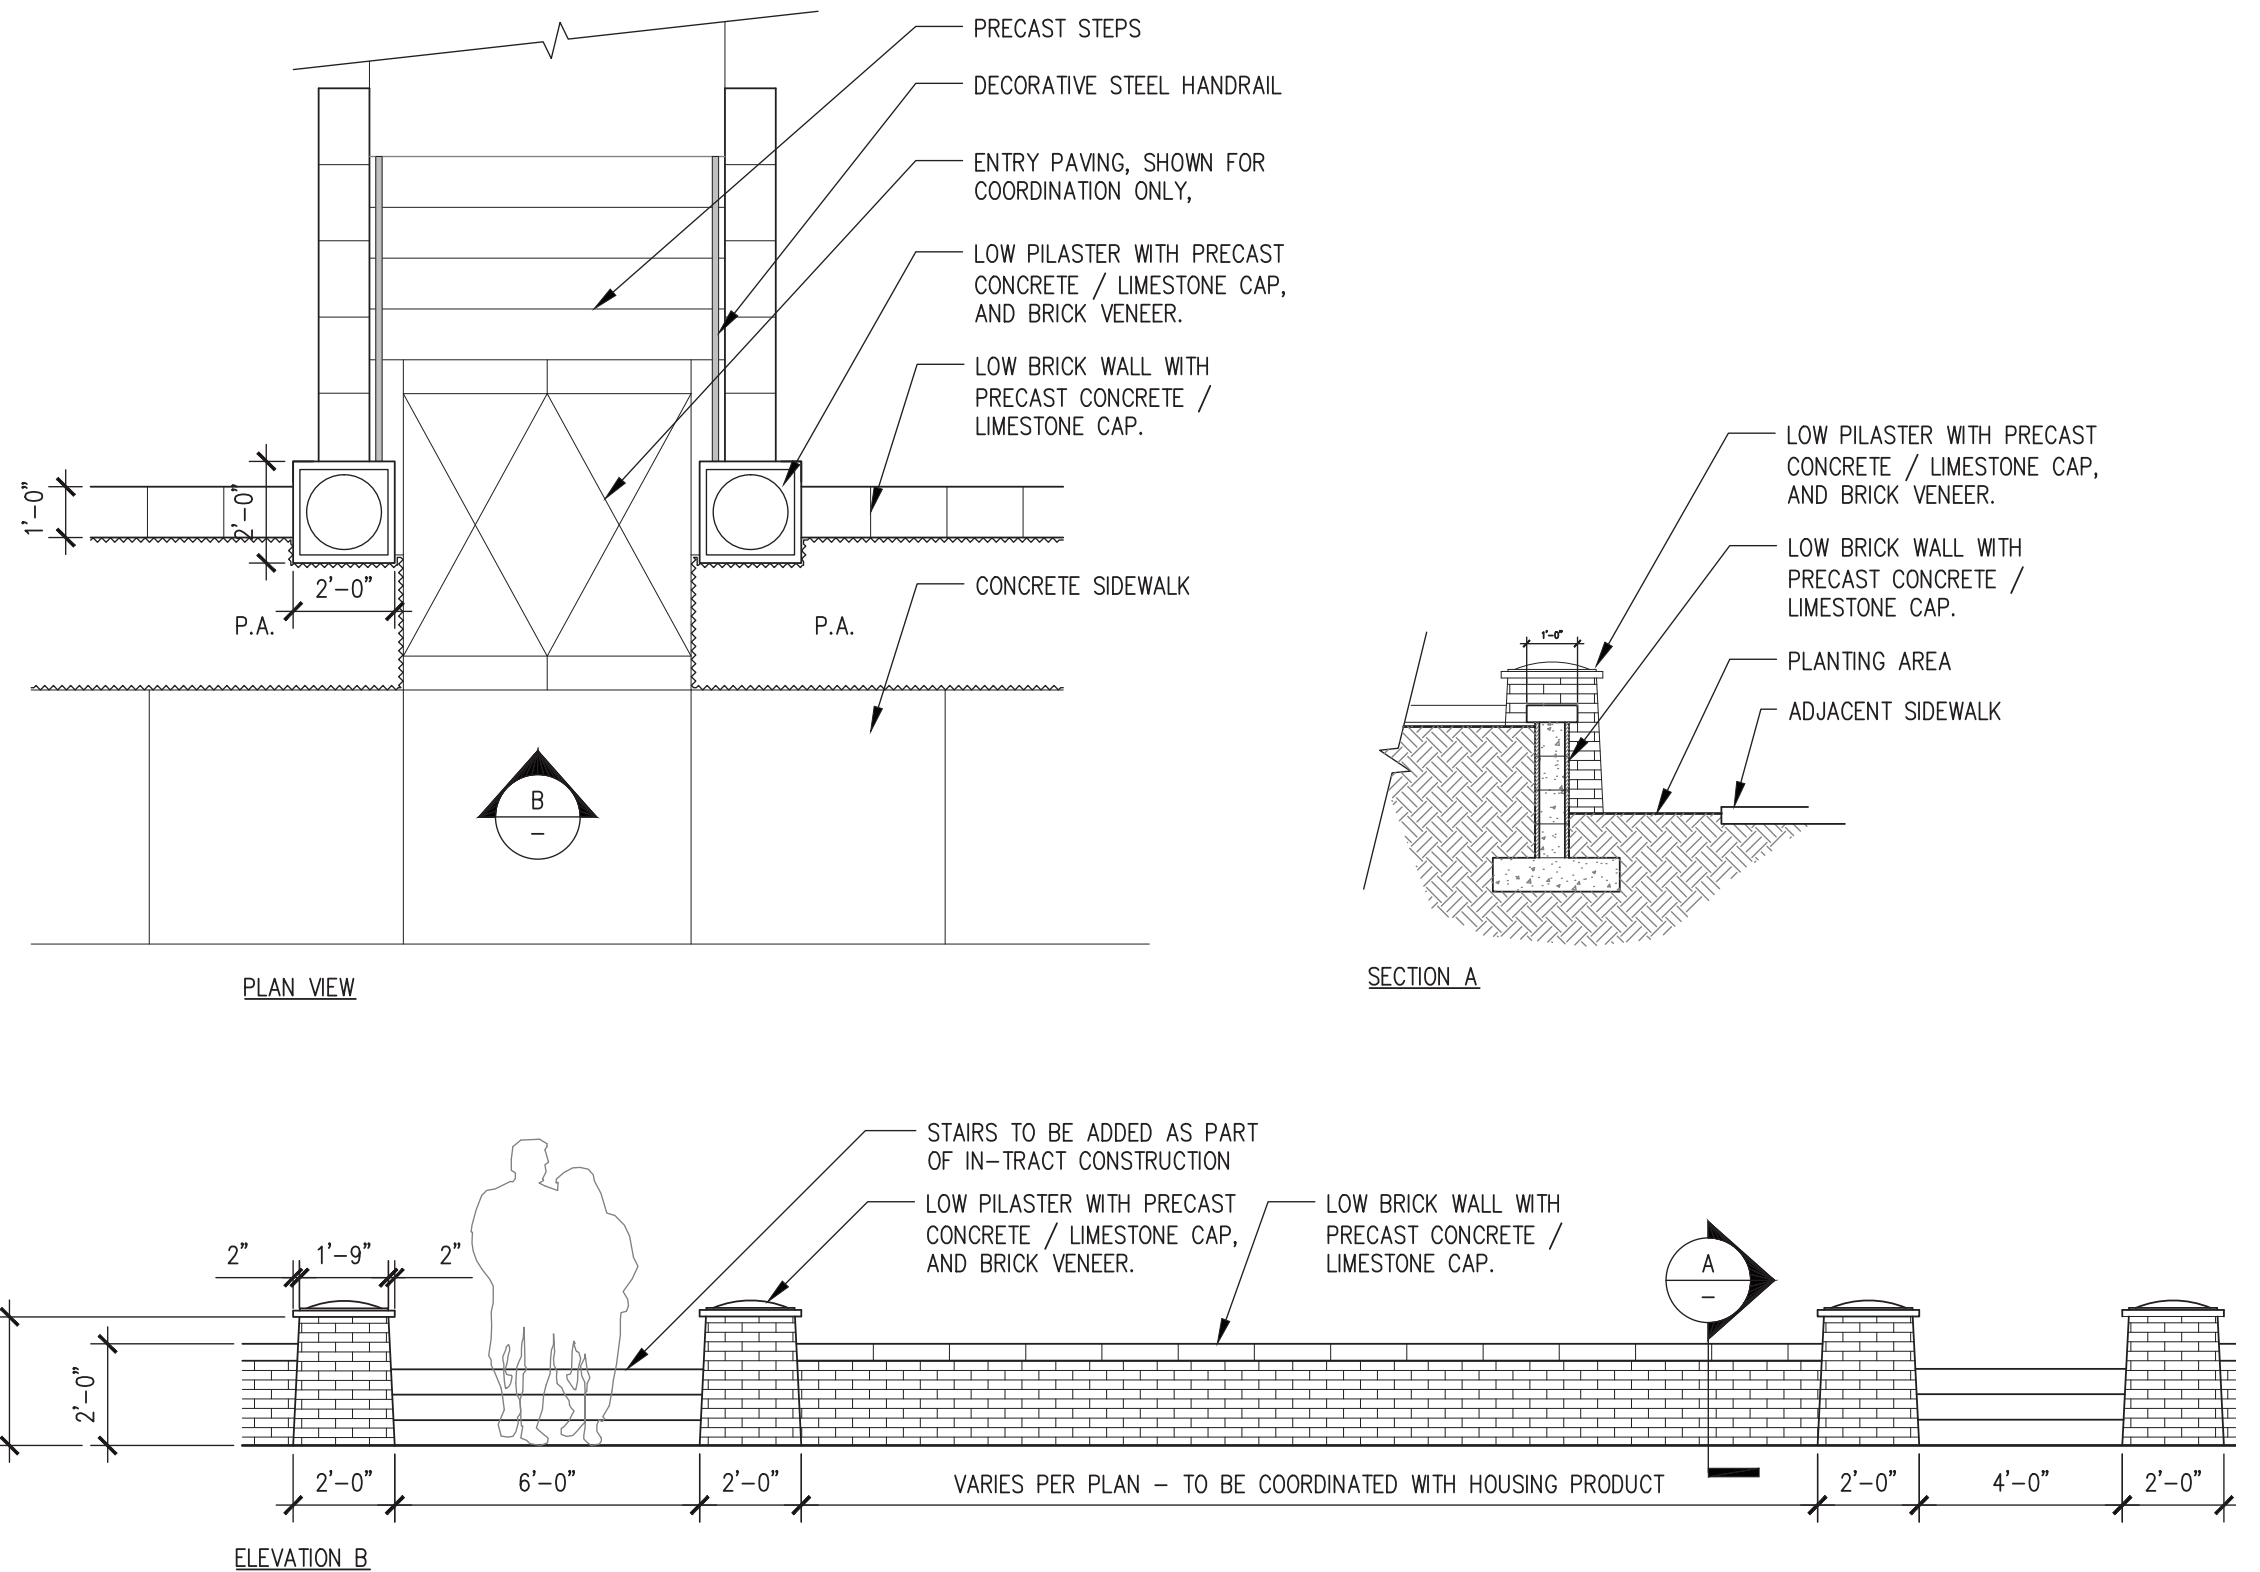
Builder to add low pilasters and stairs into developer-built low wall
